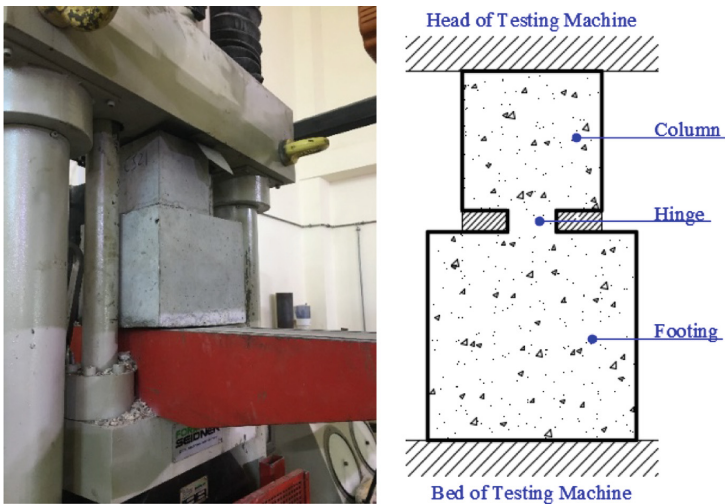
Details of the specimen instrumentations, supports, and testing machine
